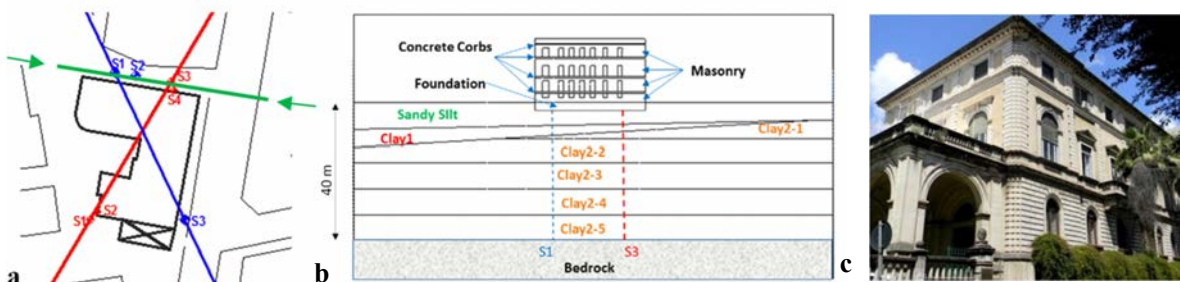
INGV building: (a) plan view; (b) analysed section (see green line in Fig. 1a); (c) photo.
